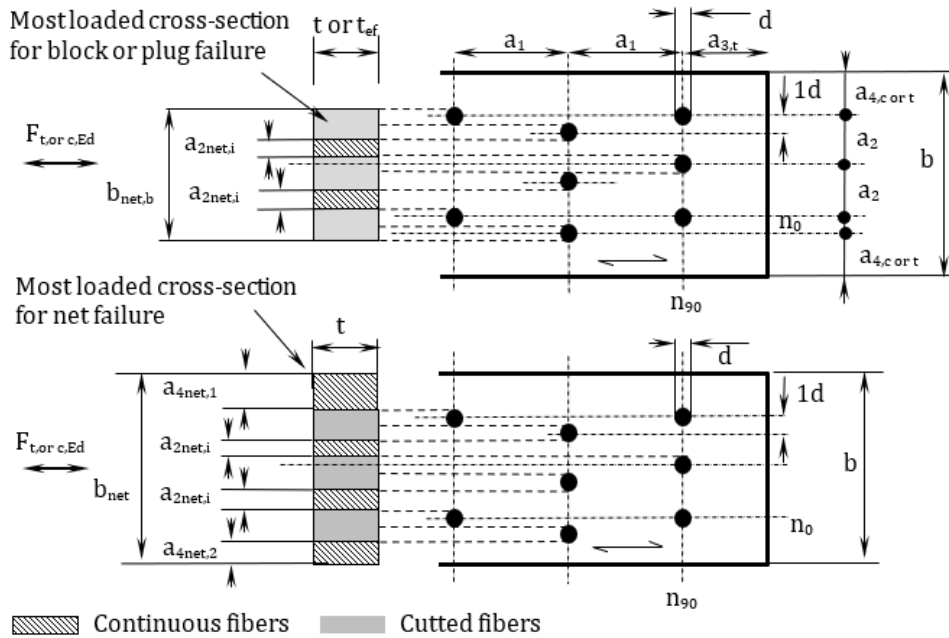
Basic geometry of a generic multiple fastener connection: net cross section definition for block, plug failure and net cross section
